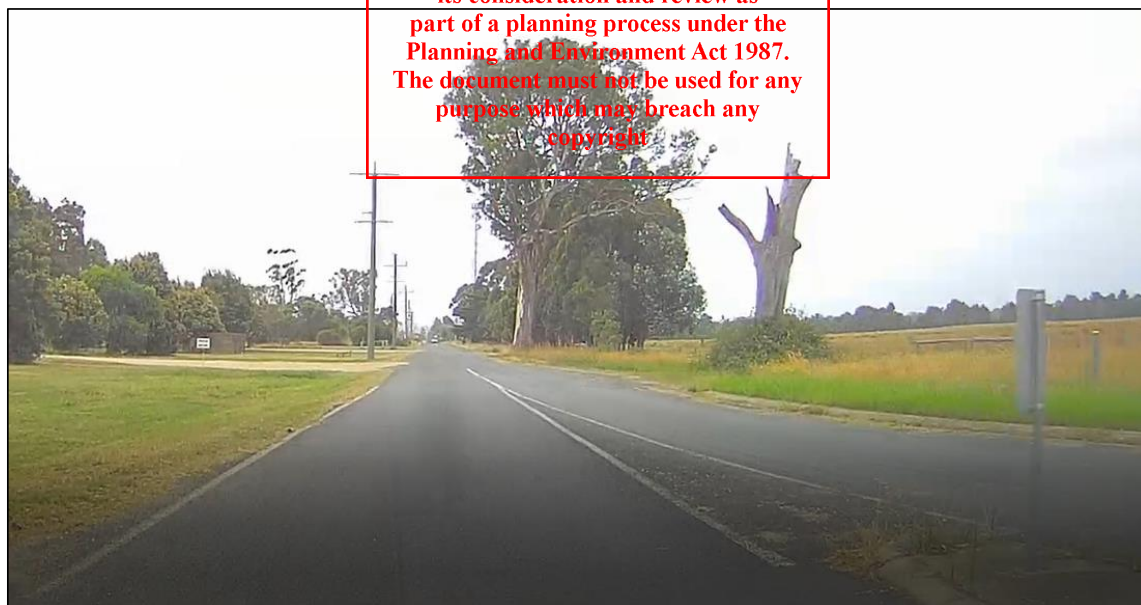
View to the north along Power Station Road north of the Princes Highway intersection.
